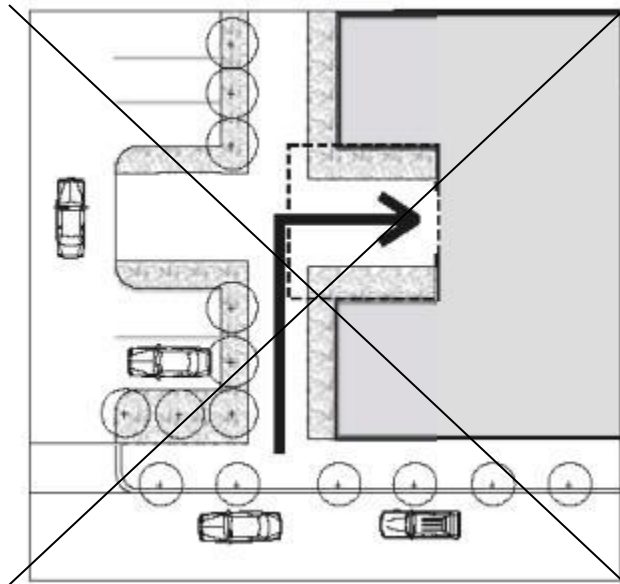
(B): Example of connection of building entrance which is not located on a street but has a clear pedestrian walkway to it.
